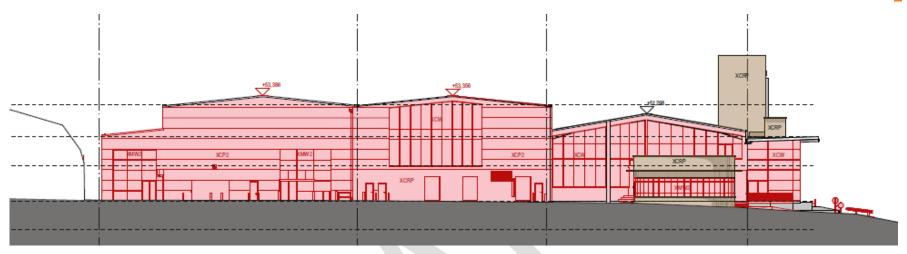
Northern elevation demolition plan (Source: TZG Architects, A-035, Revision A, October 2019).
